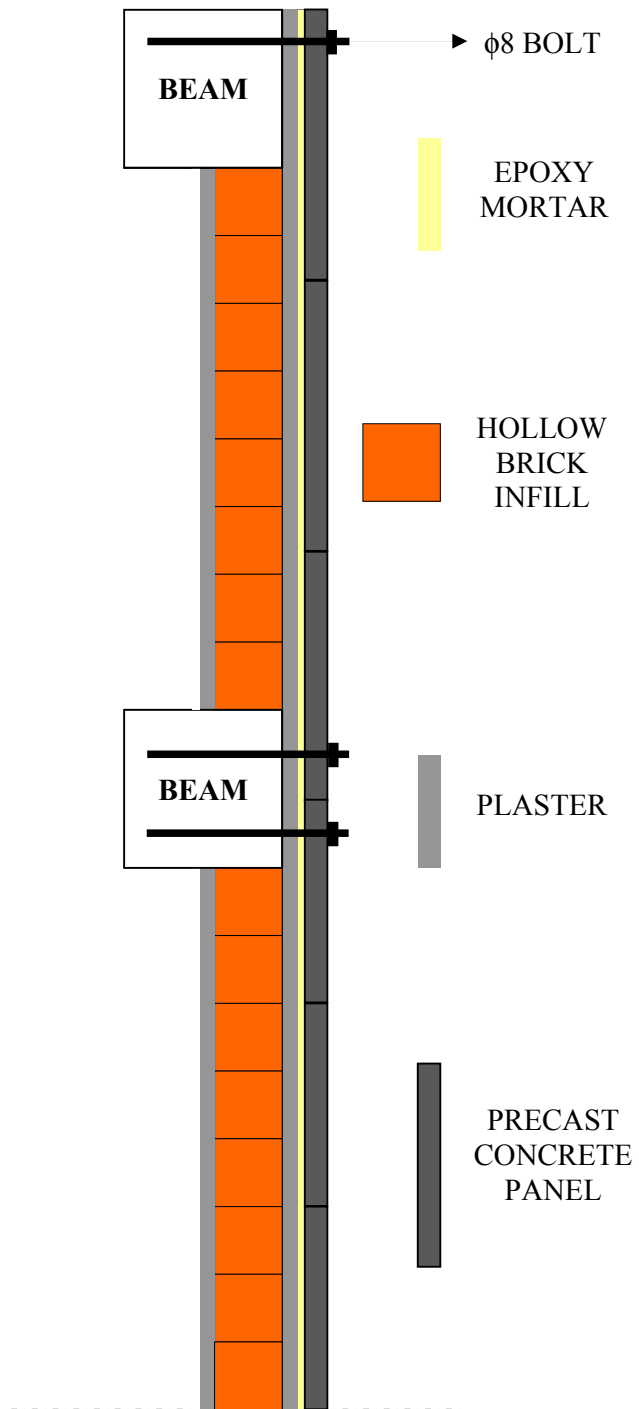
Detailing of precast concrete panel arrangement in vertical section
